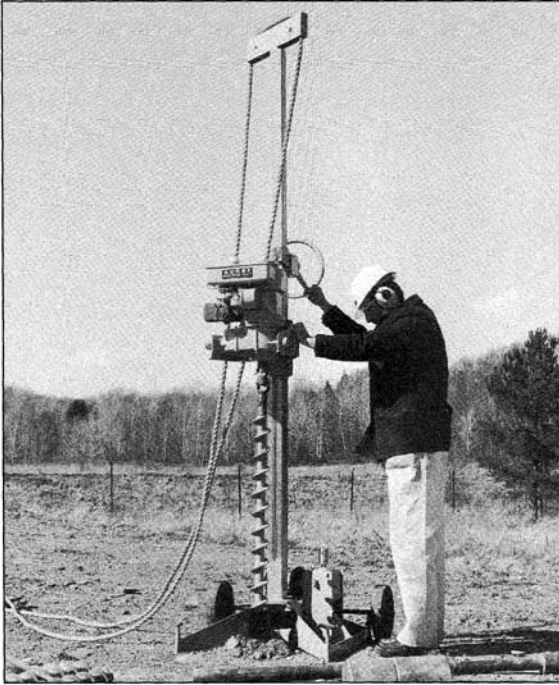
Lightweight motorized augers. (Courtesy of Acker Drill Co., Inc.)
